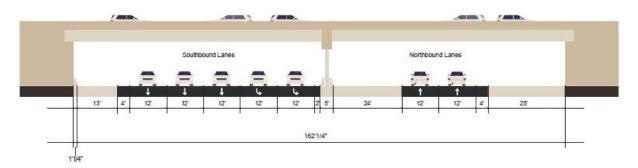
SR 535 under Osceola Parkway Bridge – Existing
